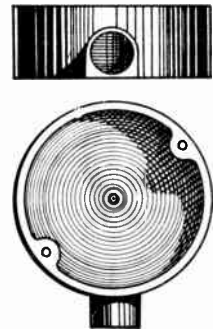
A CAST IRON SWITCH BOX FITTING FOR SCREWED CONDUIT.
